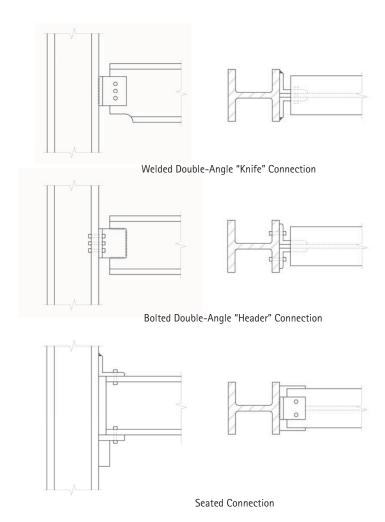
Primary girder-to-column connection types (shown in elevation and plan-section)
